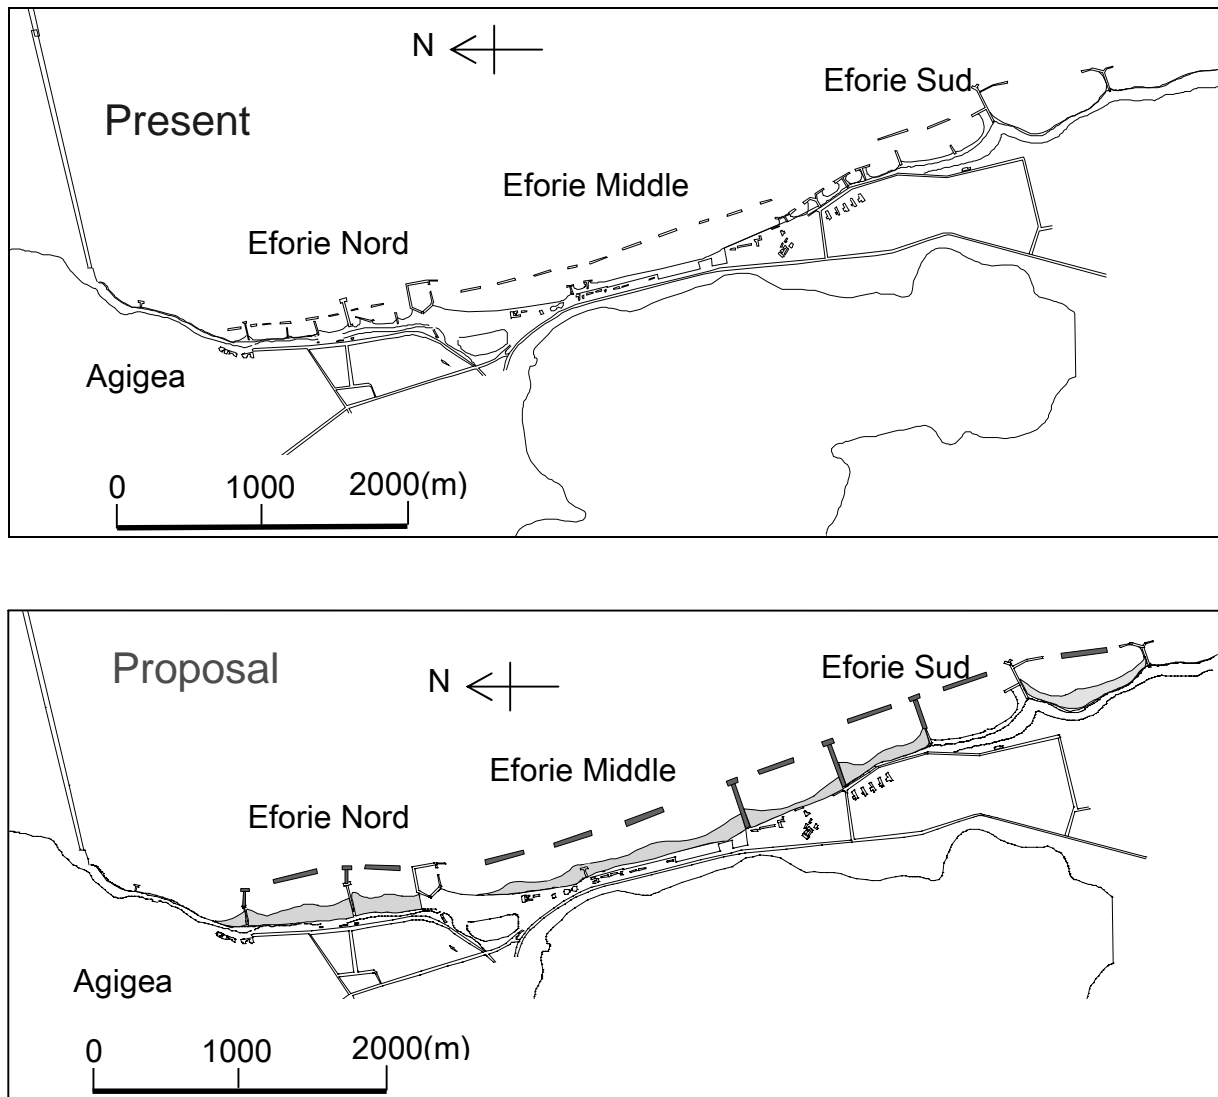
Modified proposal of shore protection facilities at Eforie Sector
